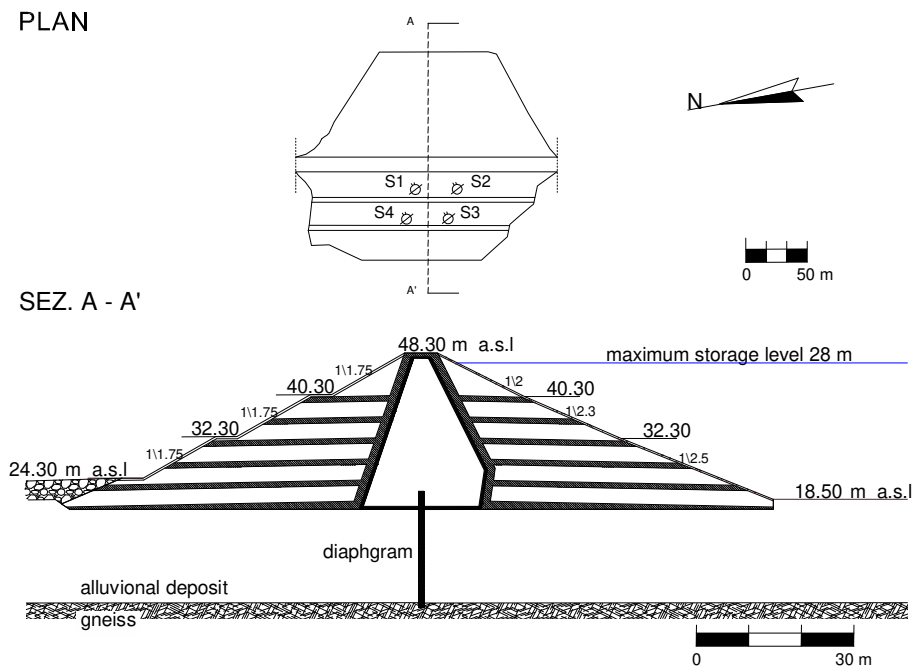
Plan view and main cross section of Monte Marelo zoned dam.
